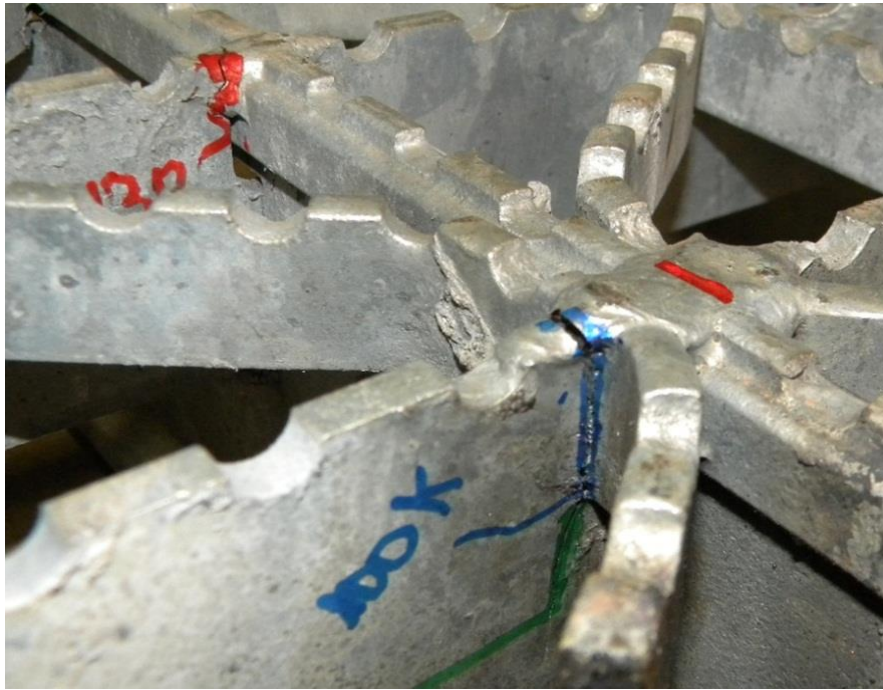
'P' crack initiation from puddle weld
